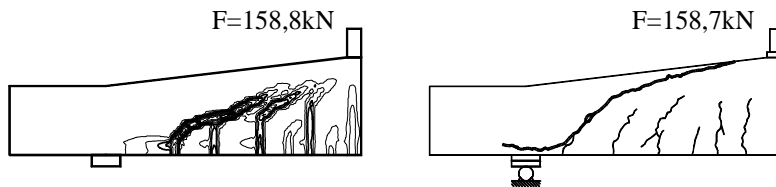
Crack propagation at failure of test beam 3K1 from Non-FEM and test
